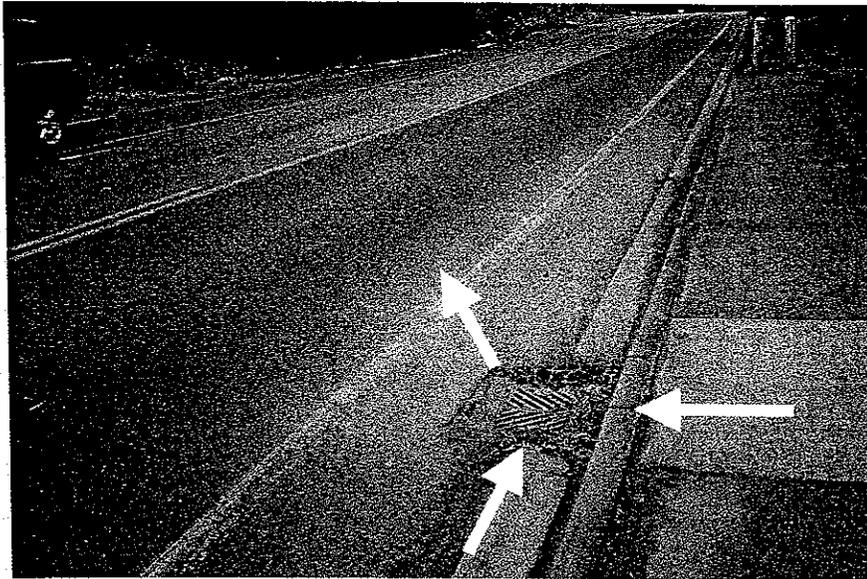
Downstream catch basin from photo 10. CB outfalls to the southeast crossing Sultan Basin road. Outfall to the shown catch basin is from an existing detention pond shown in photo 12.
